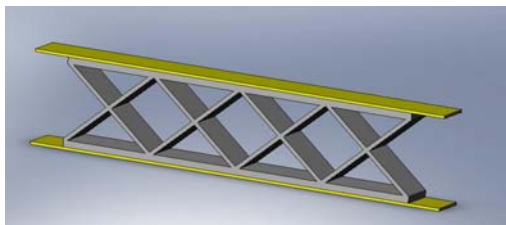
Illustration of foldable/expandable Soldier crossing unit.
